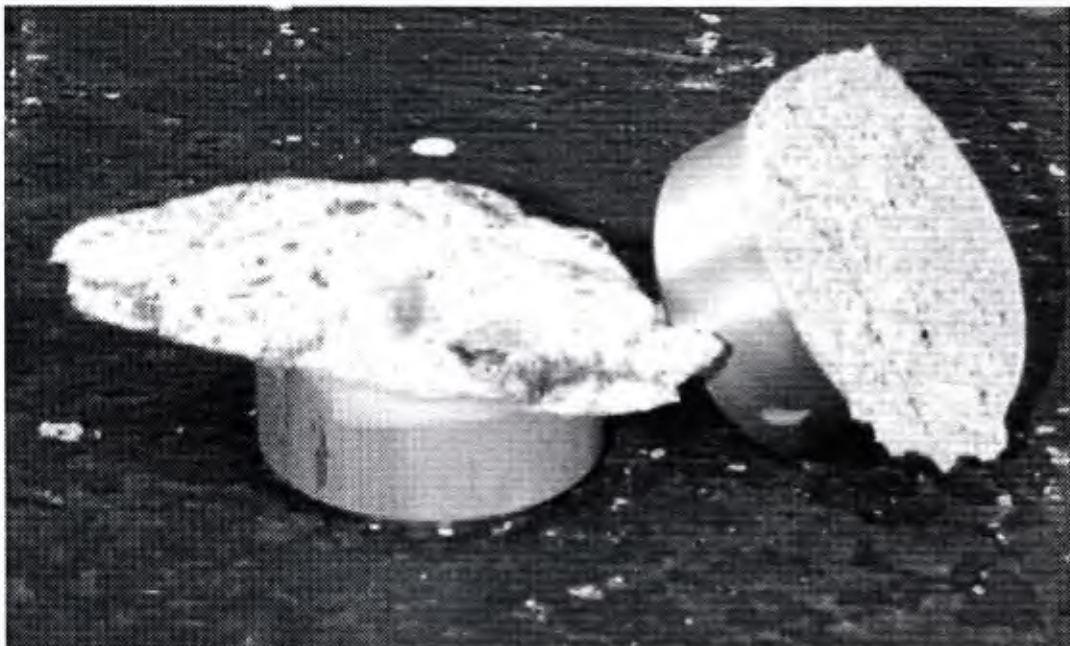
Pull-off test "pucks". Unprimed concrete surface on left puck and primed concrete surface on right puck.
